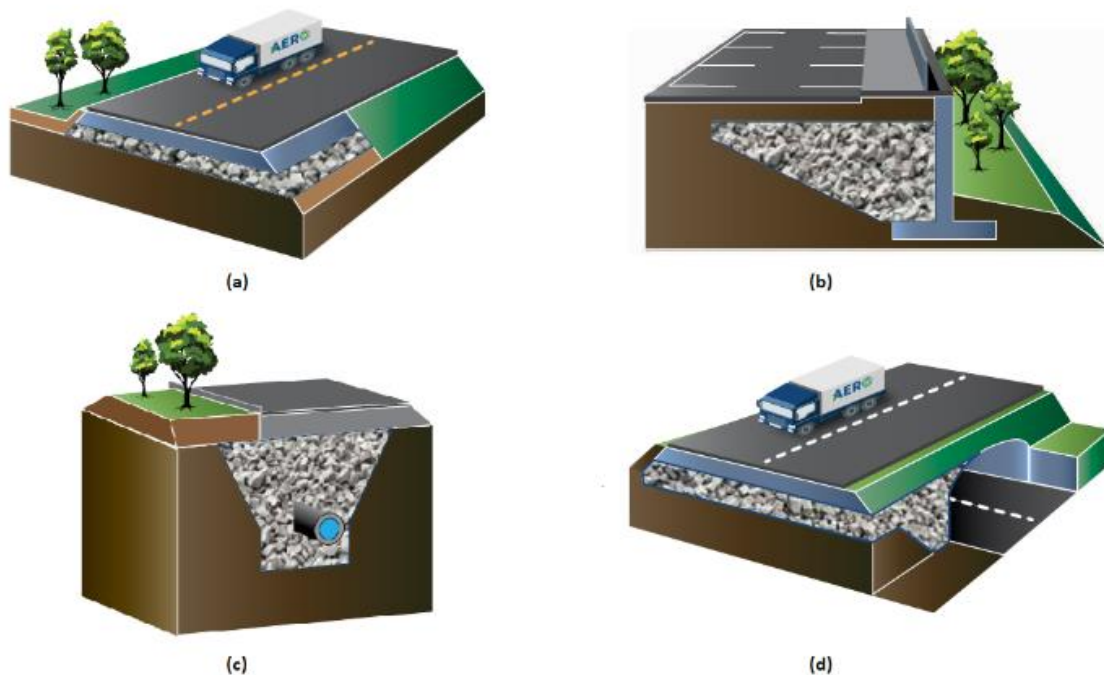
UL-FGA application areas on infrastructure projects include (a) in embankments, (b) retaining walls, (c) around and over utilities, and (d) around and over culverts and tunnels.
